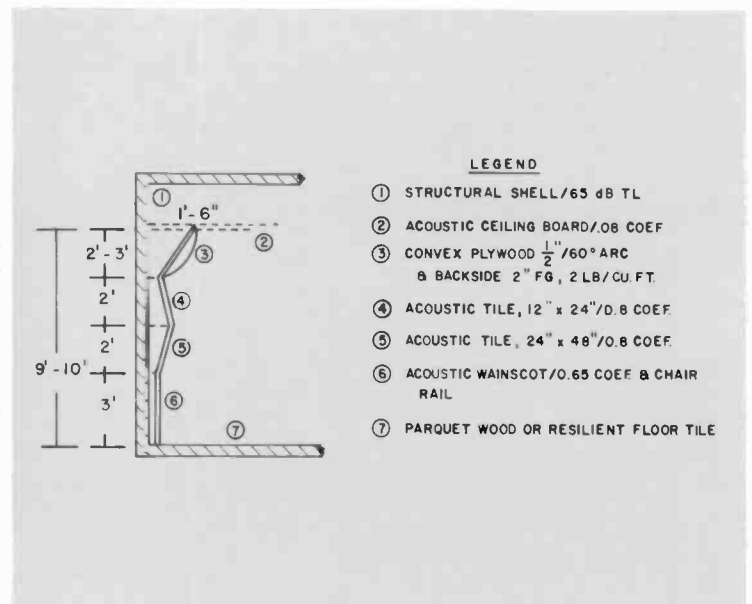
Interior outline of the wall sections for control rooms and tape mastering rooms.
